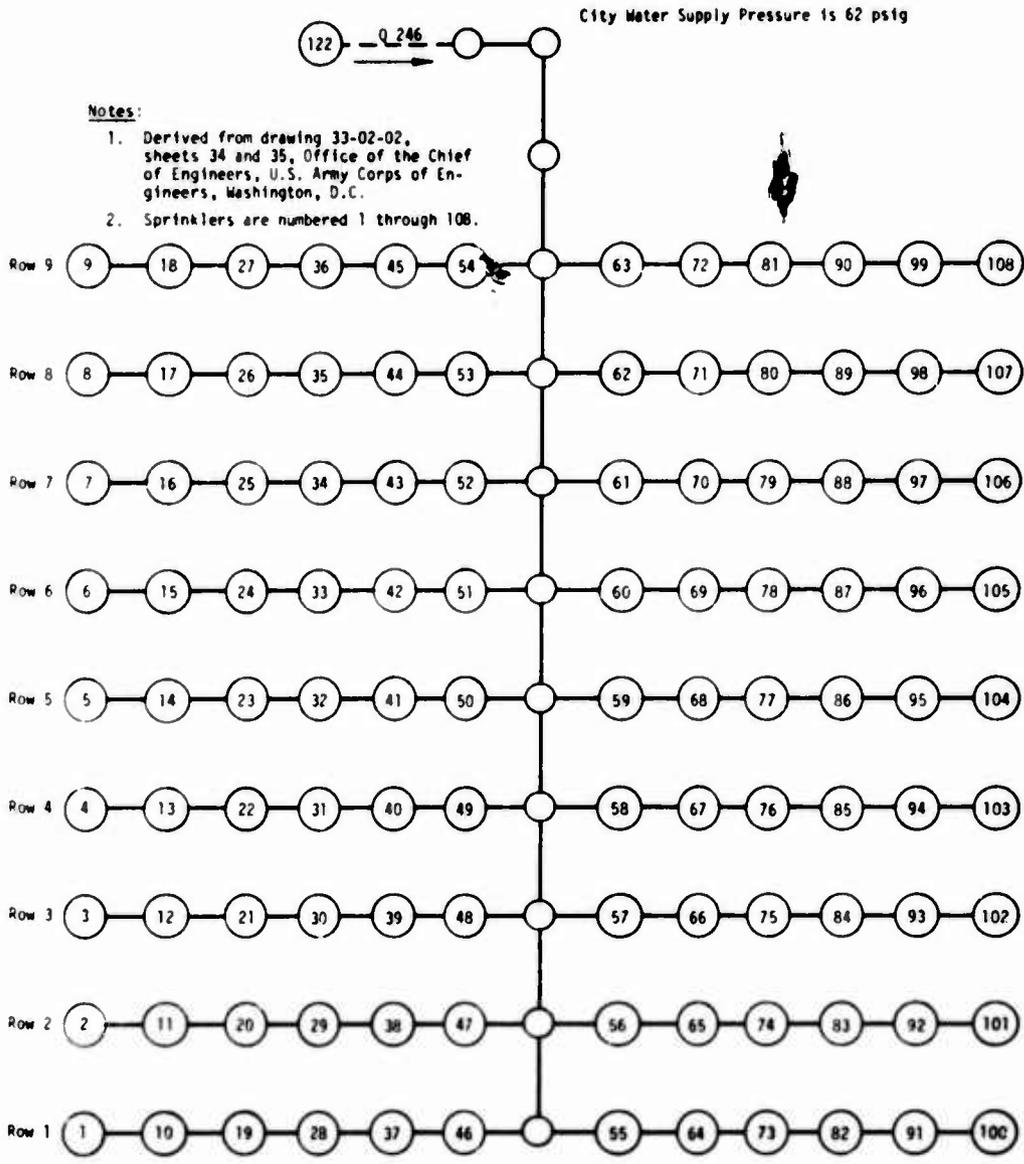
Sprinkler System in Buildings 10, 18, and 412 at Tinker Air Force Base
